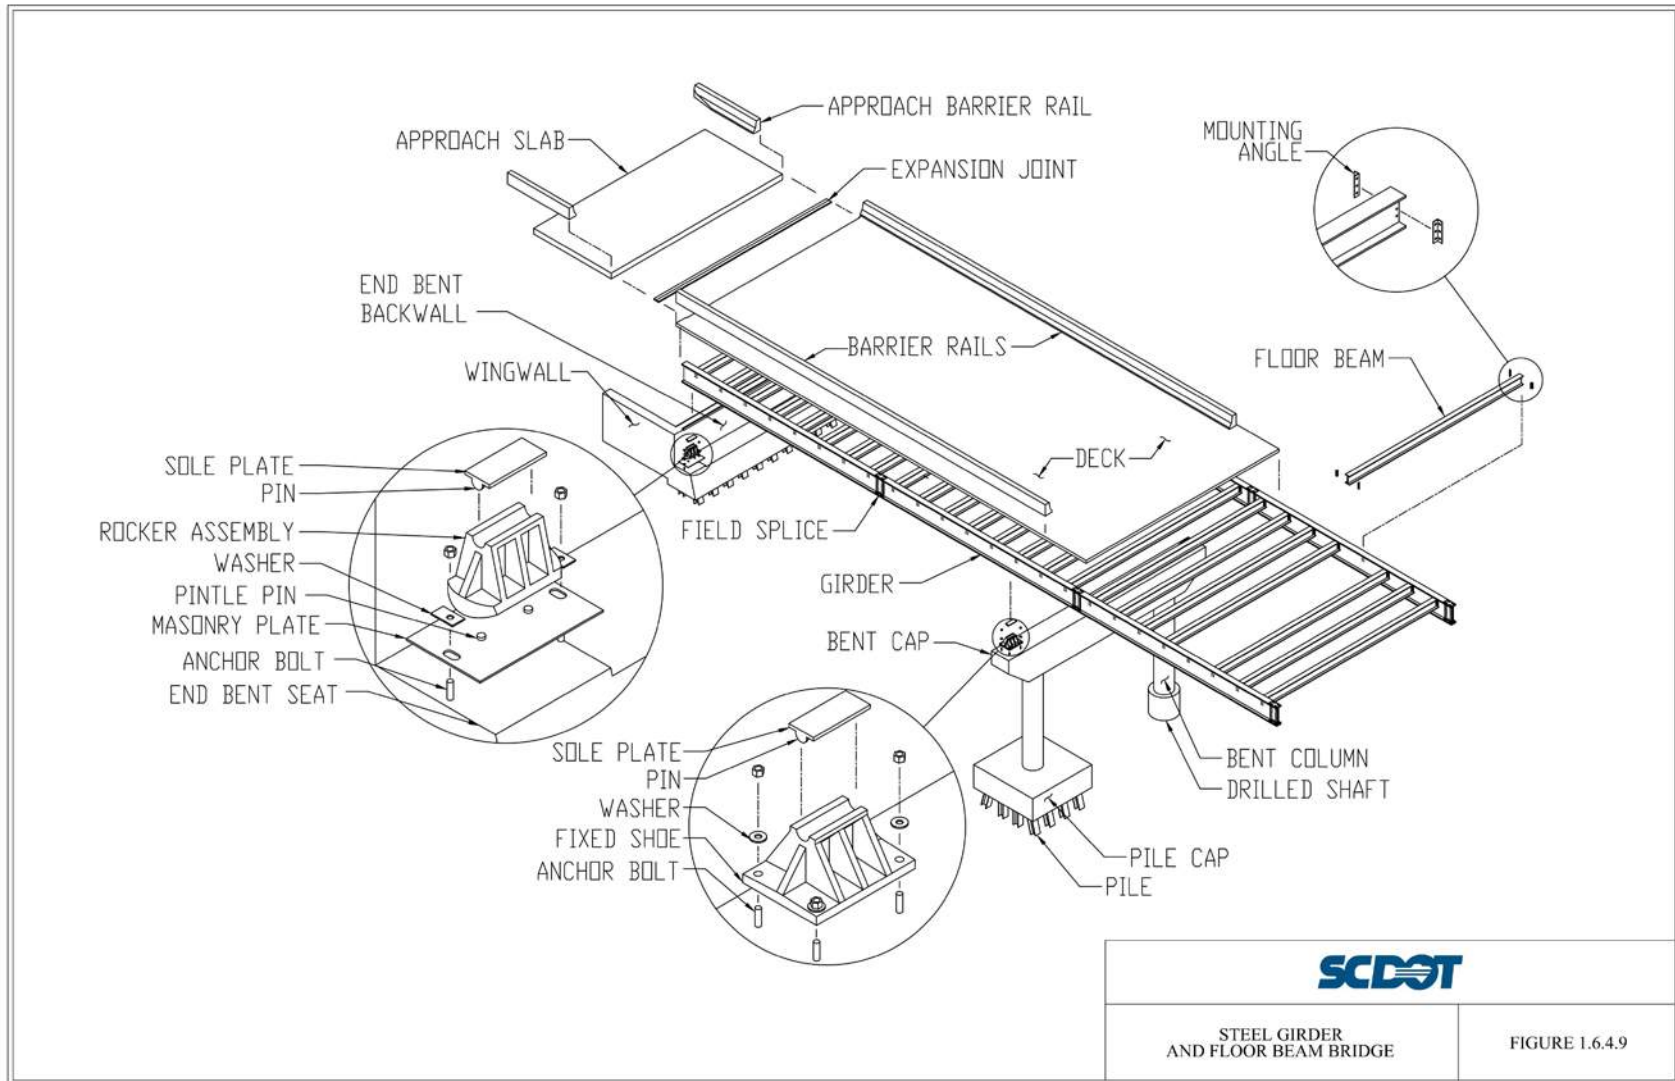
Steel Girder and Floor Beam Bridge Components
